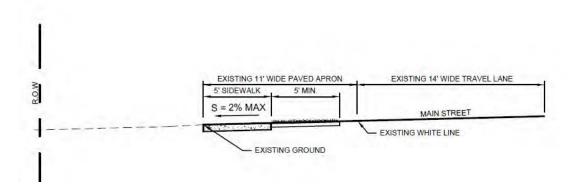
Sidewalk Cross Section Southwest of Athens Drive
